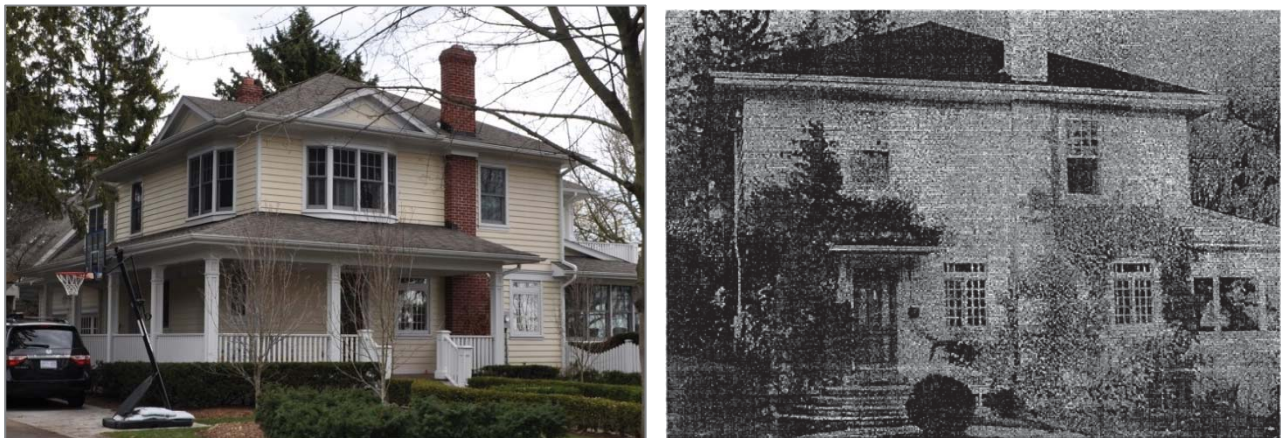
Compatible porch added to 25 Second St. in 1991 (left); 25 Second St. prior to 1991 (right) (source: original First and Second St. HCD Plan, 1991).
